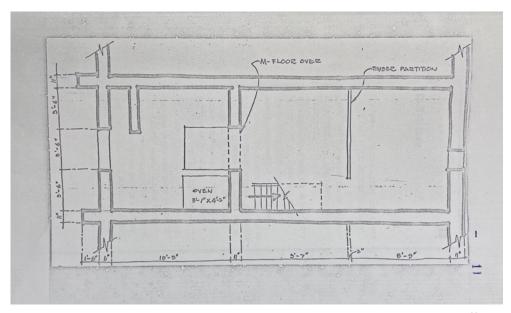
Typical layout of dwellings in Tin Liu village, sketch drawn in late 1960s⁸³
